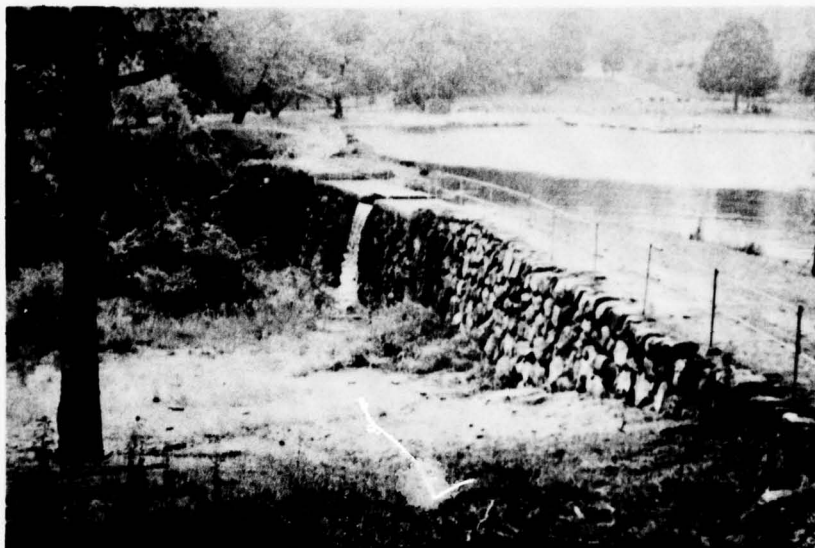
View of dam from left abutment showing original rock masonry dam.
